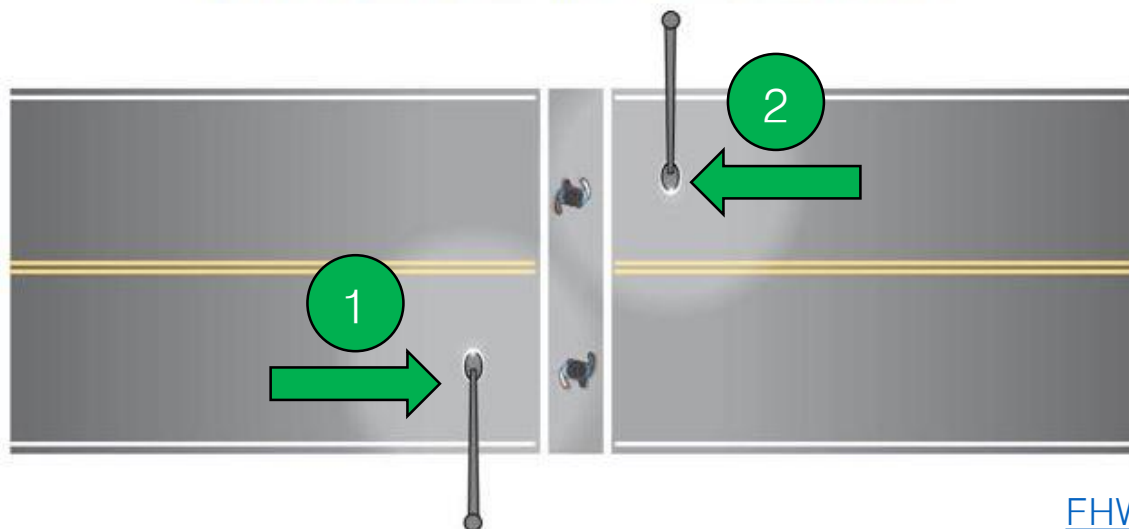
Drawing. New design for midblock crosswalk lighting layout.
